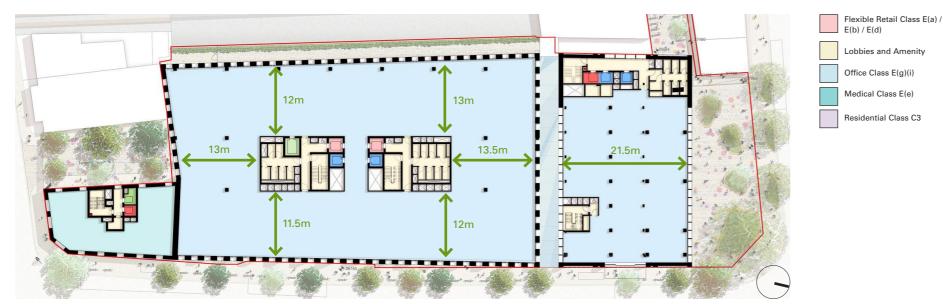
Revised Illustrative Typical Floor Plan presented at Pre-Application Meeting 6
